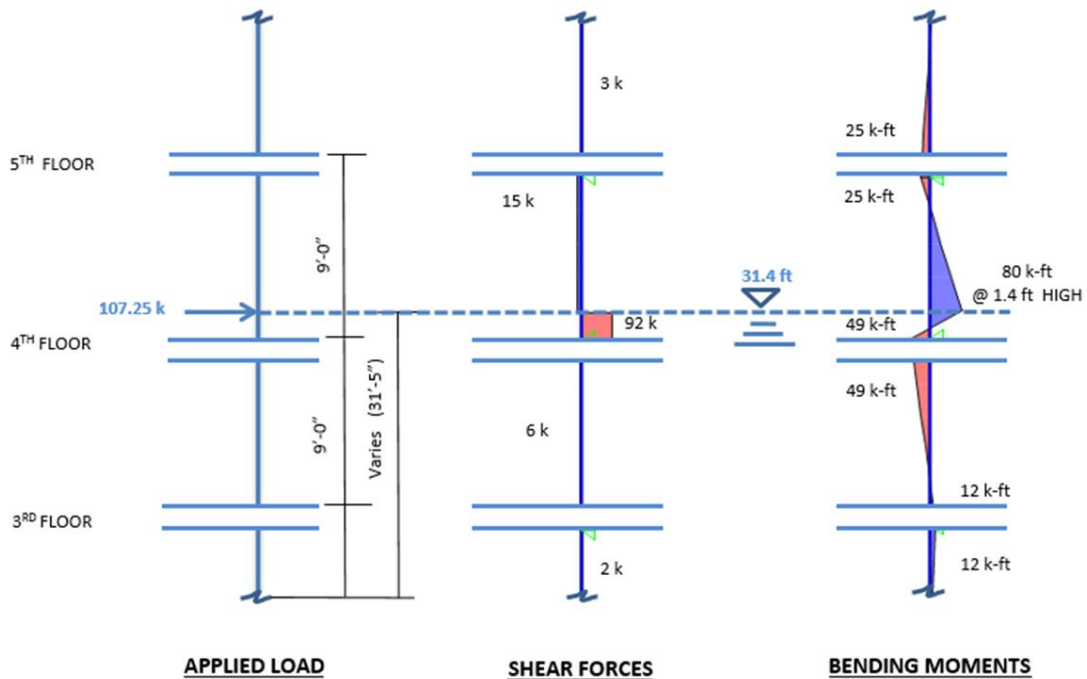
Impact load applied at 1.4 ft away instead of " d " as water level is lower than " d " away from the end of column on the 4th floor
